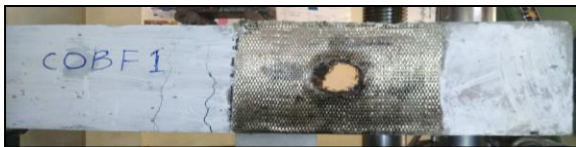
Crack pattern of beam with opening strengthened using BFRP sheets
